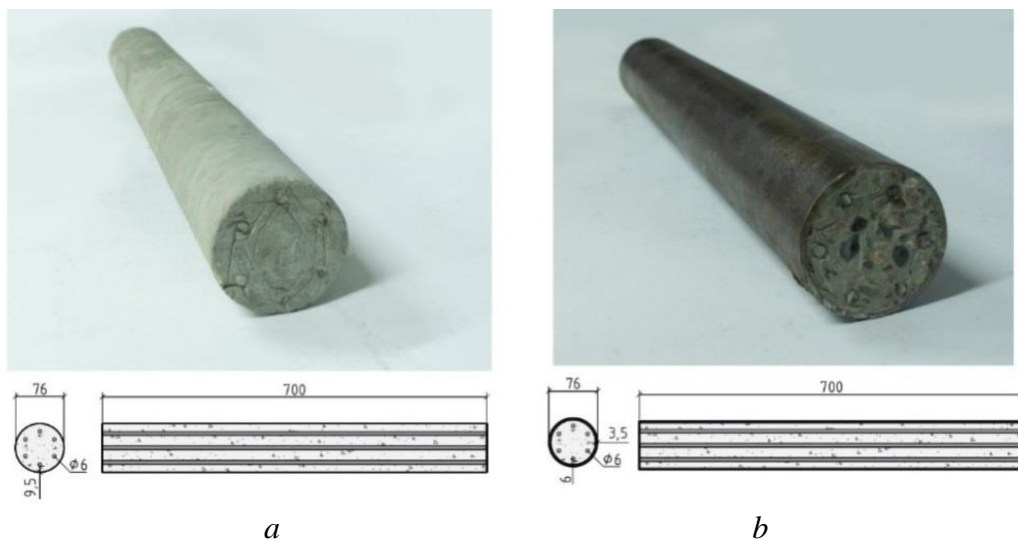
Additionally made specimens: *a* – reinforced concrete (700 mm); *b* – reinforced concrete-filled steel tube (700 mm)
